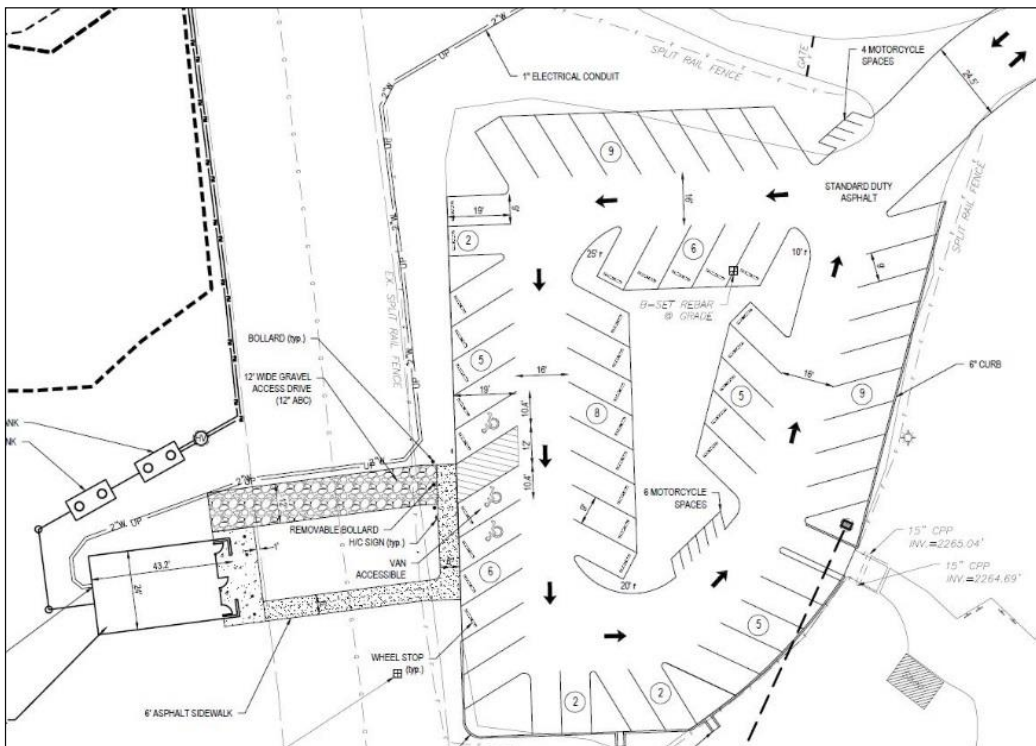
Plans for parking lot improvements at Hooker Falls access area
